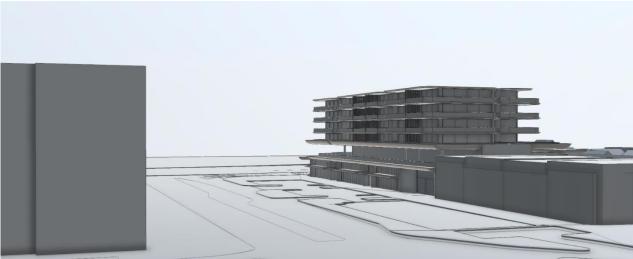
Perspective of proposed development amongst existing commercial and mixed use buildings on the northern side of Ramsgate Road and to the west of the site (Source: Craft Architecture)
